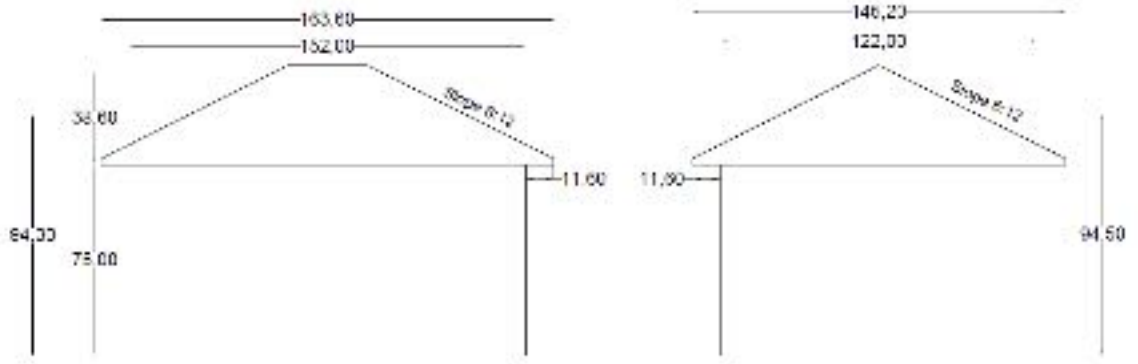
6: Model E layout (a) Elevation View (b) Side View (all dimensions are at model-scale in cm)
